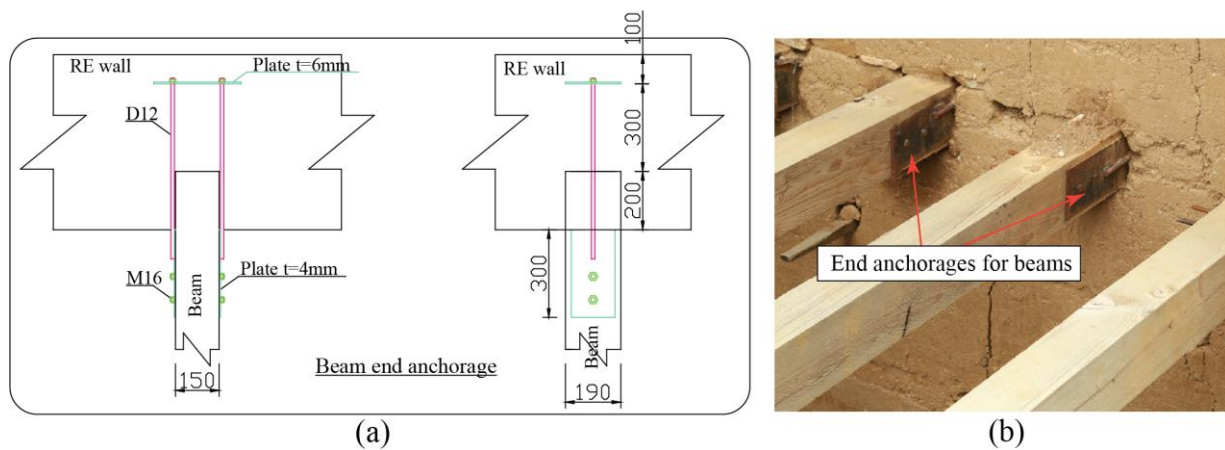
Details of: (a) Beam end anchorage; (b) Photo details of beam end anchorage at site.
